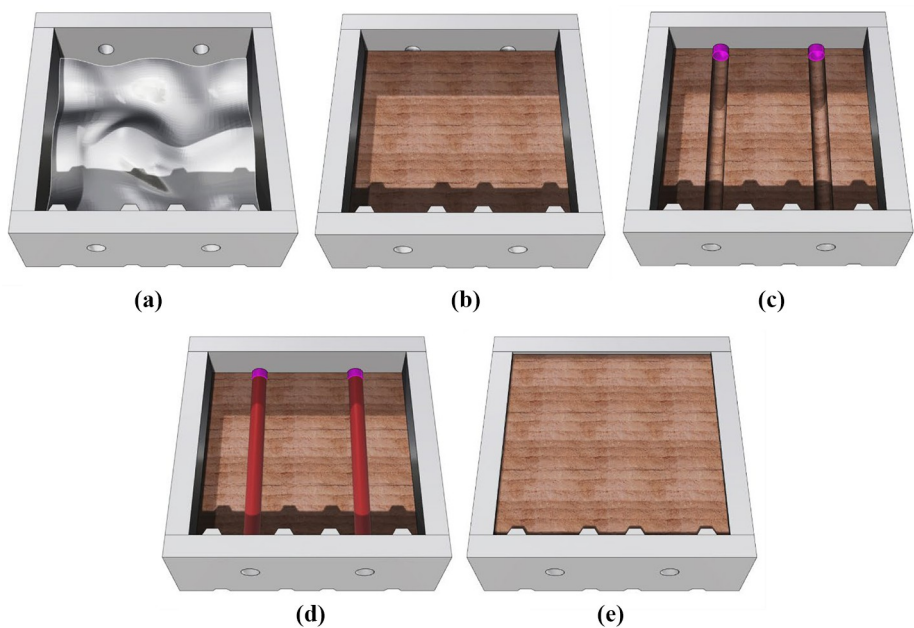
Block production: (a) the formwork assembled, (b) filling soil and ramming the initial layers, (c) concentrating the ramming force to create a gap for the PVC tubes and assembly of the clamps, (d) assembly the tubes in position and (e) filling soil and ramming remaining layers and completing the final ramming sequence
